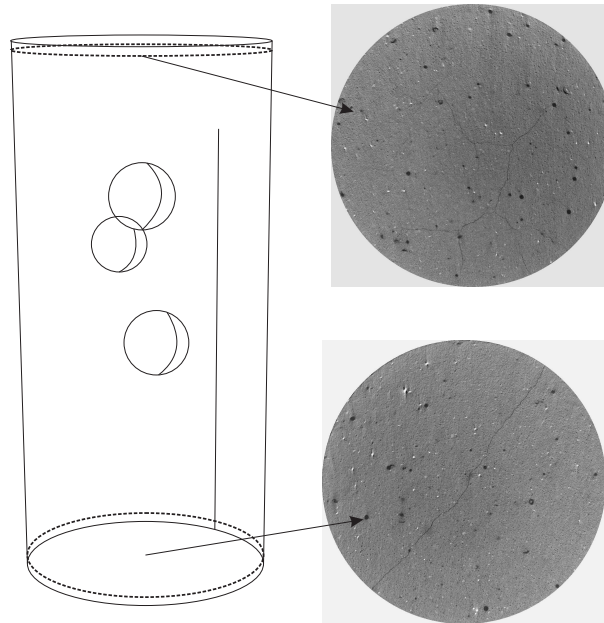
Cracks initiating on the top and bottom faces of the specimen, leading to spurious fracture modes.
